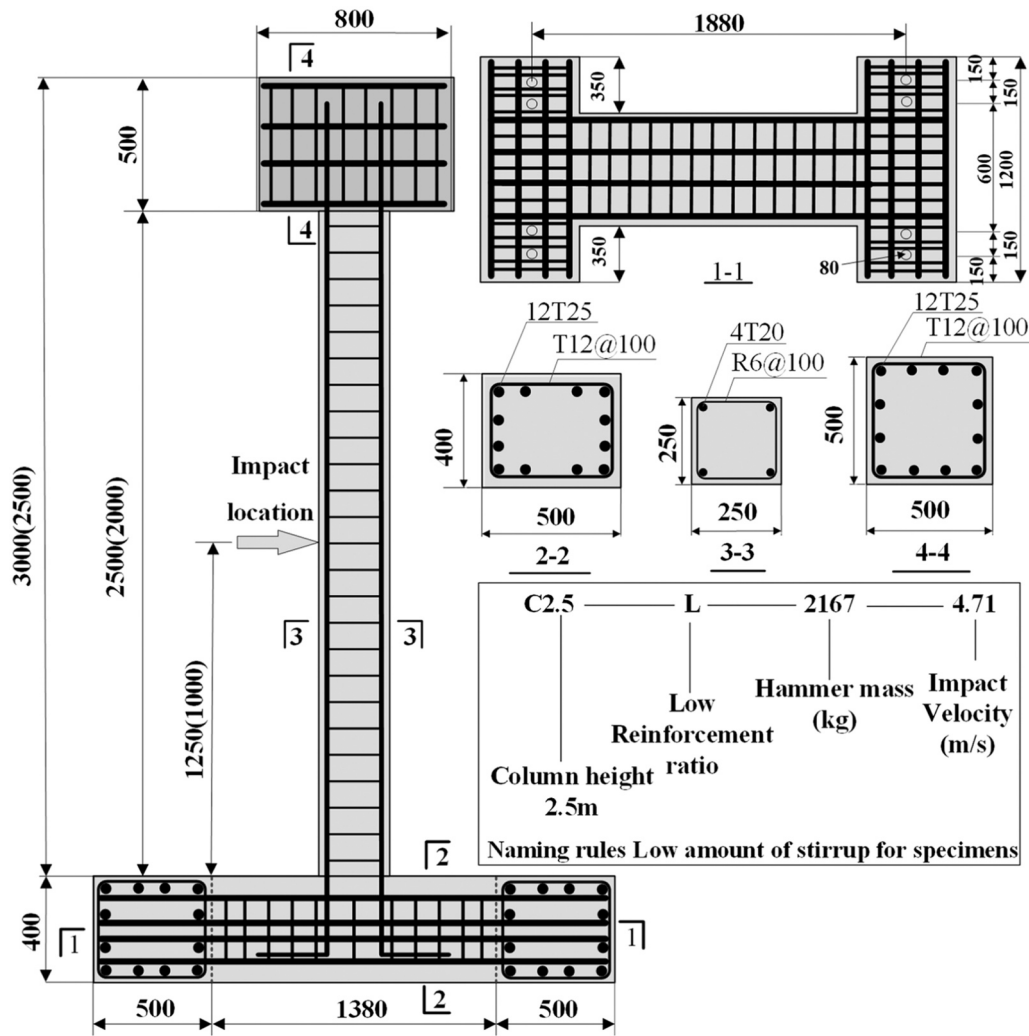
Reinforcement scheme and geometric dimension of specimens (unit: mm).
